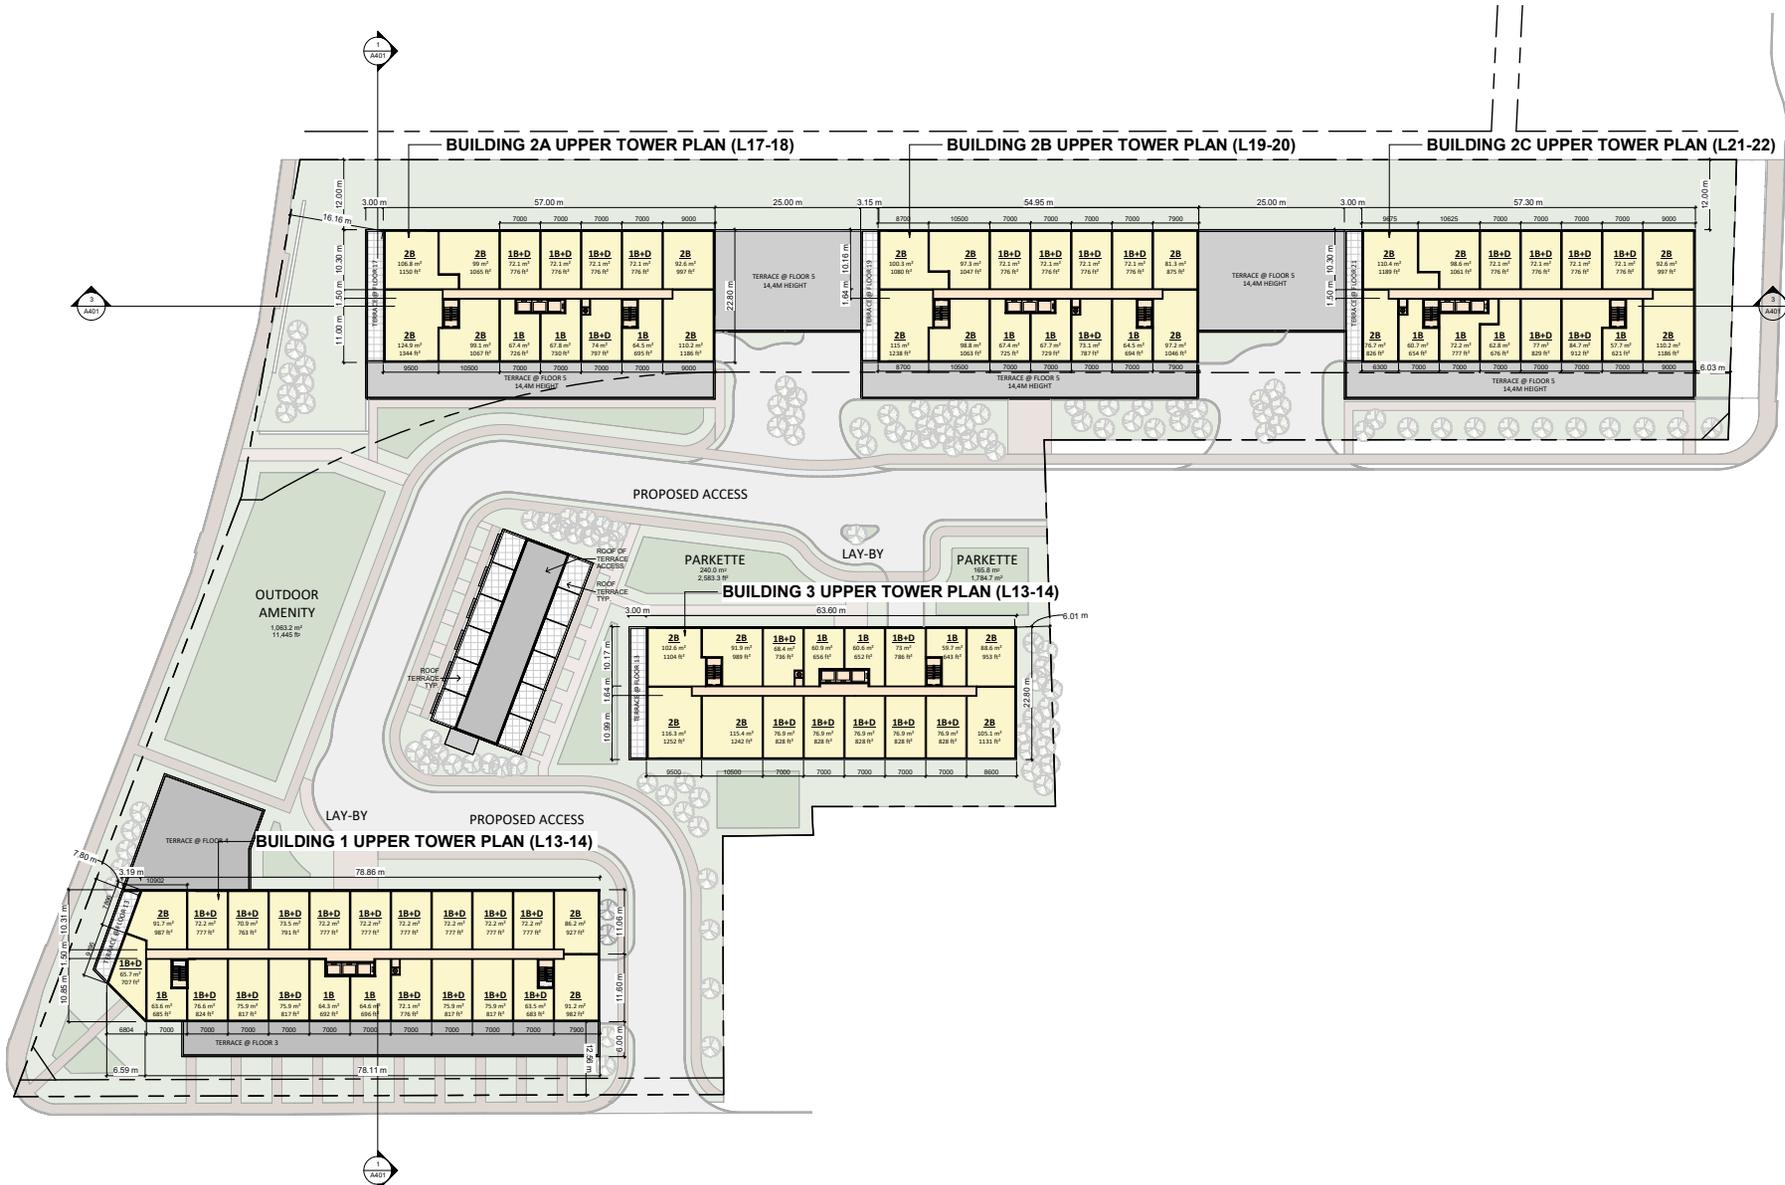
Typical Upper Tower Floor Plans, prepared by Turner Fleischer
